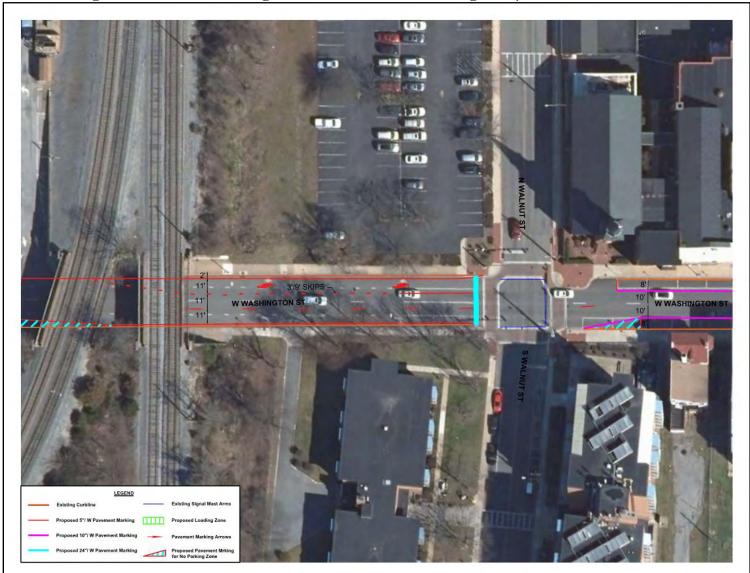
Pavement Marking Recommendations at Washington St/Walnut St Intersection
